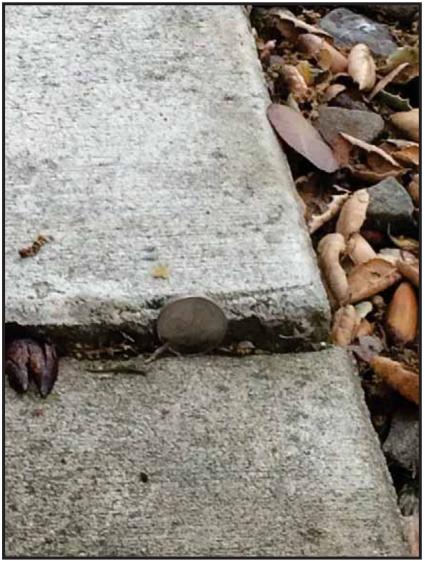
Close –up of sidewalk uplifting next to Tree 1, approximately ¾ ".
